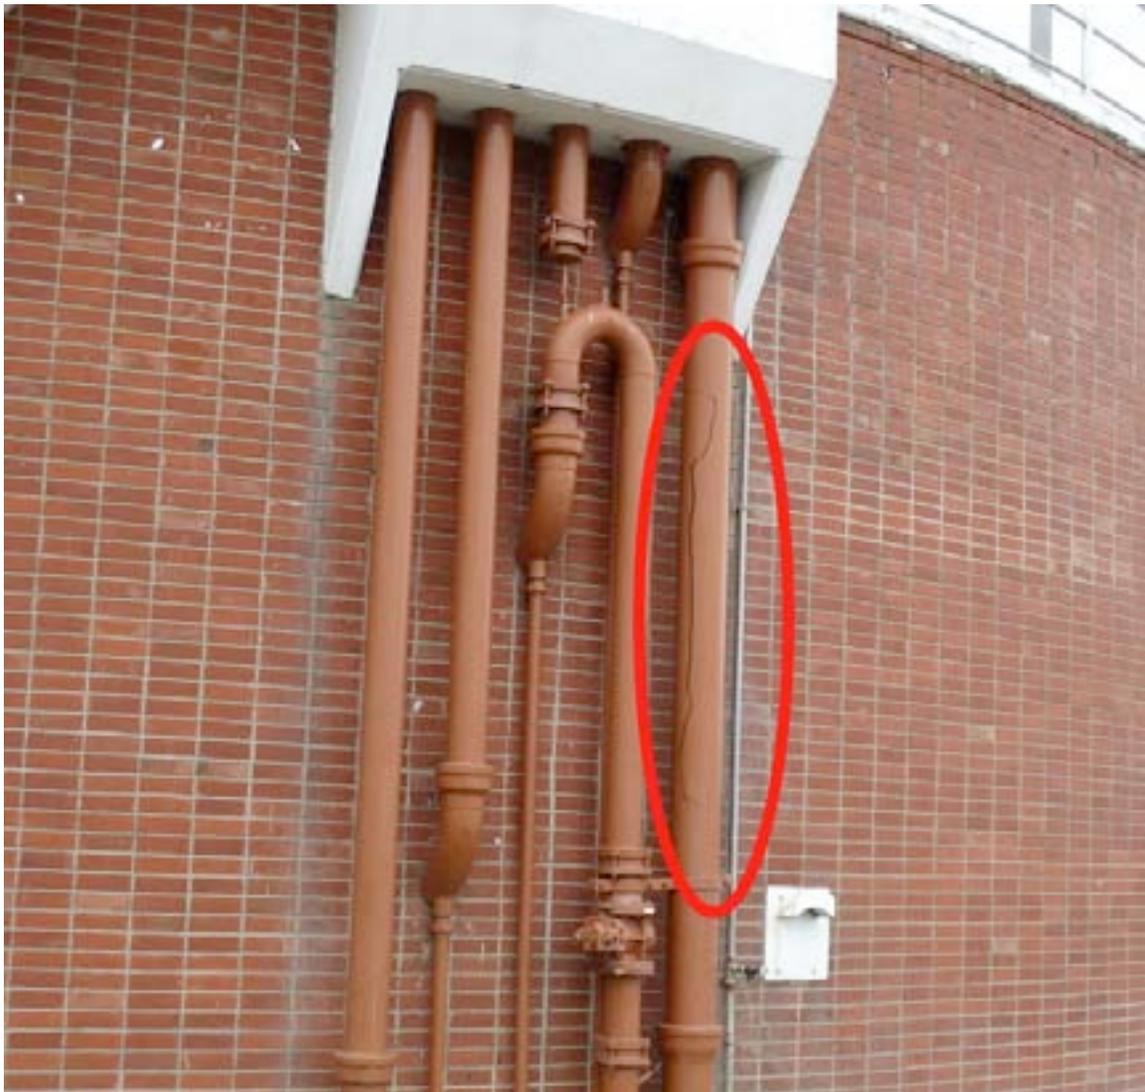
Cracked Pipe to Digester, Bromley WWTP
